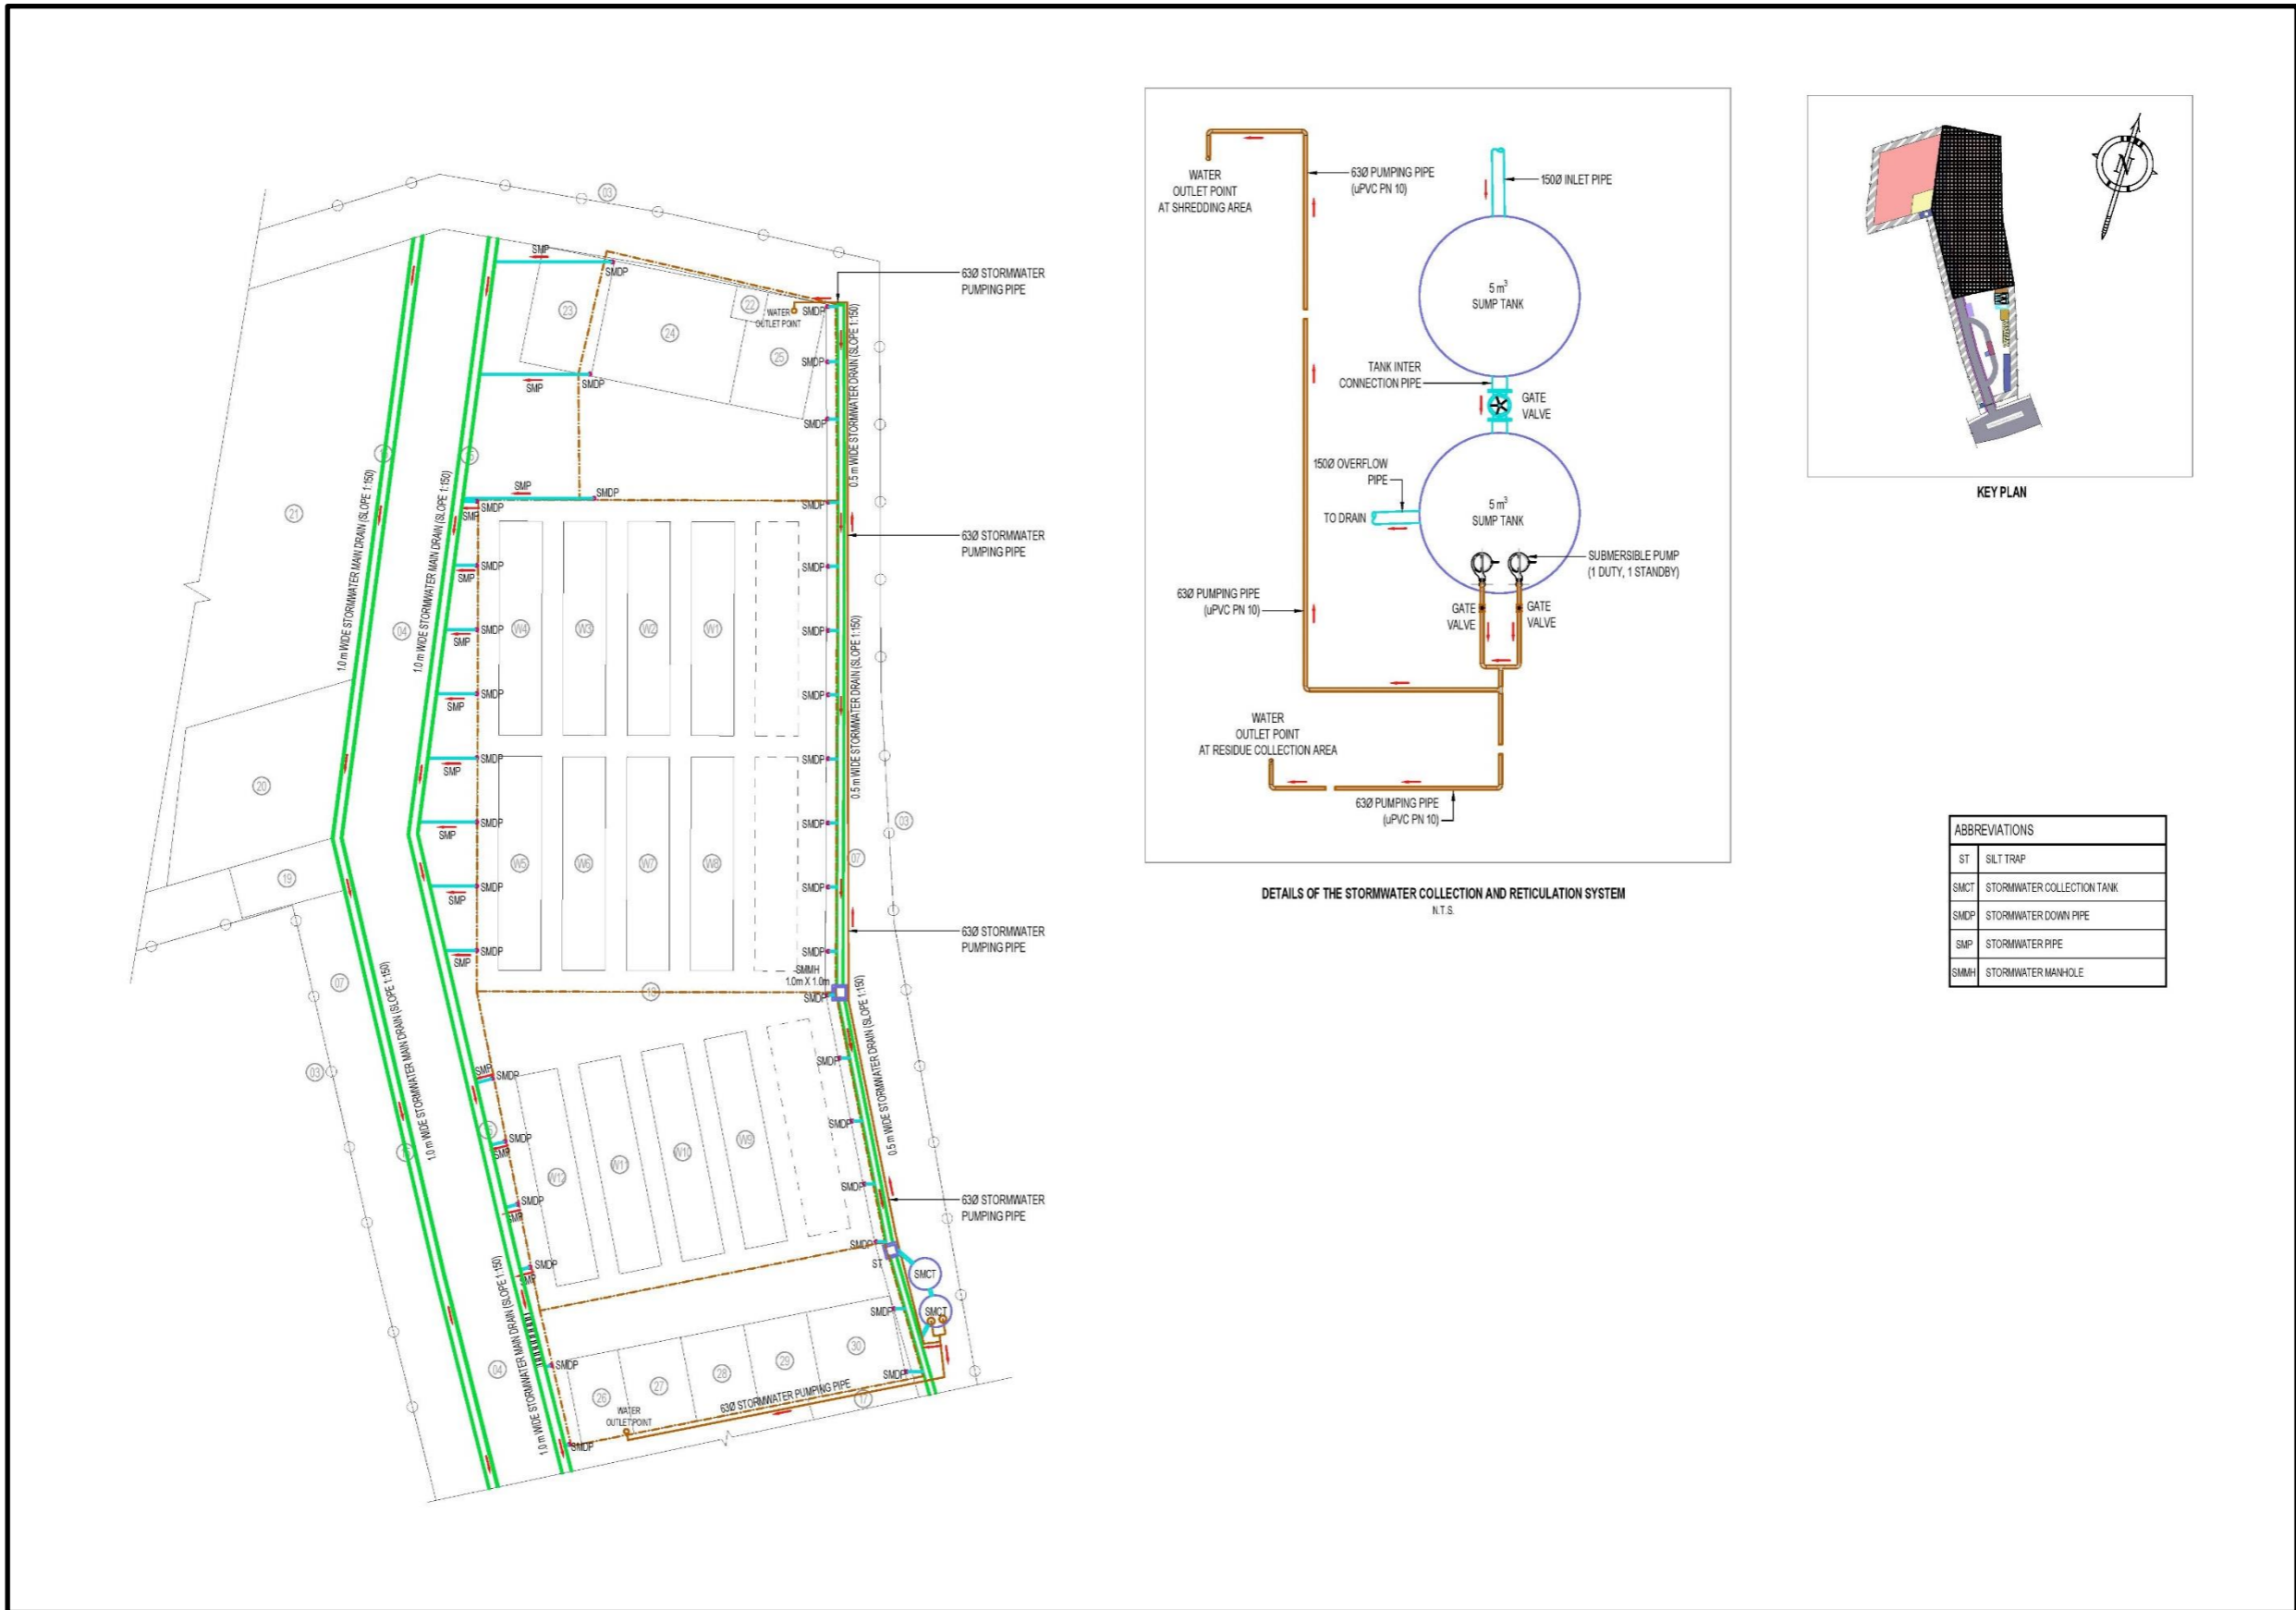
Stormwater drainage system of the proposed ISWM facility (Part 1)
